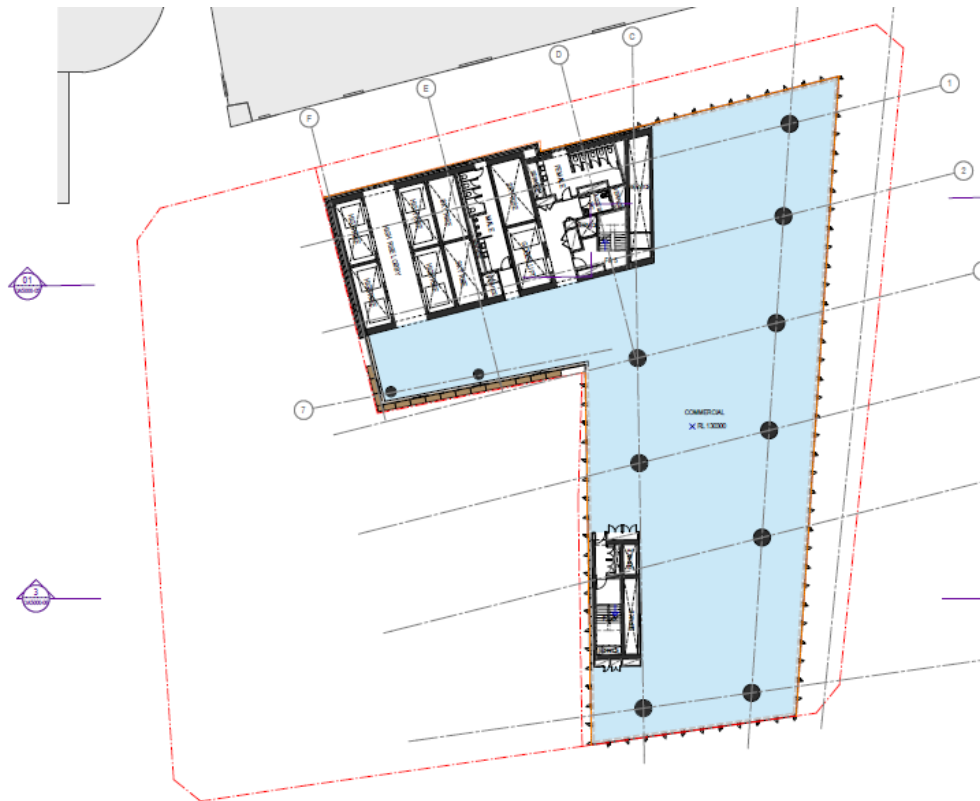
Proposed Level 30-42 - typical high-rise commercial office floorplate
